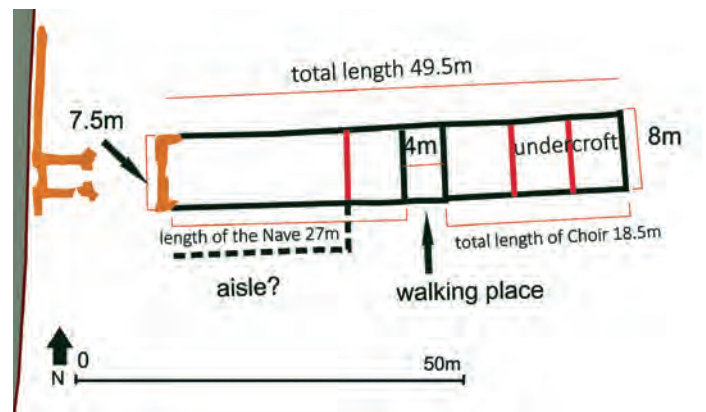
Plan of Burnham Norton Friary site in the fourteenth century. Plan: © Pat Kadwell
